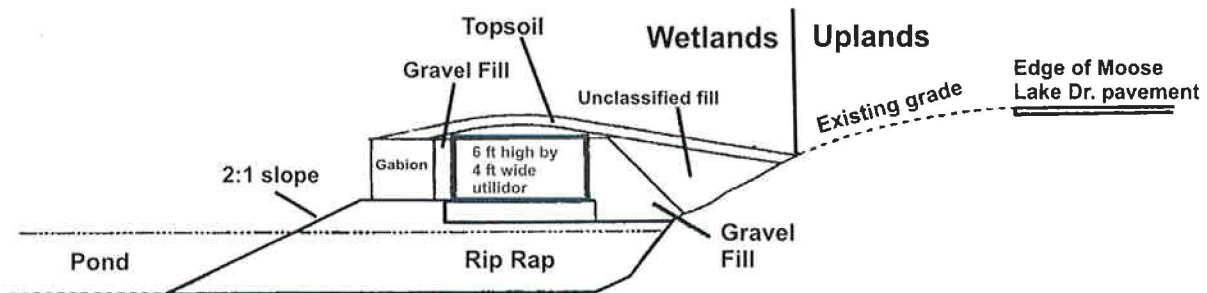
Cross-section of Typical Utilidor Construction in Wetlands
